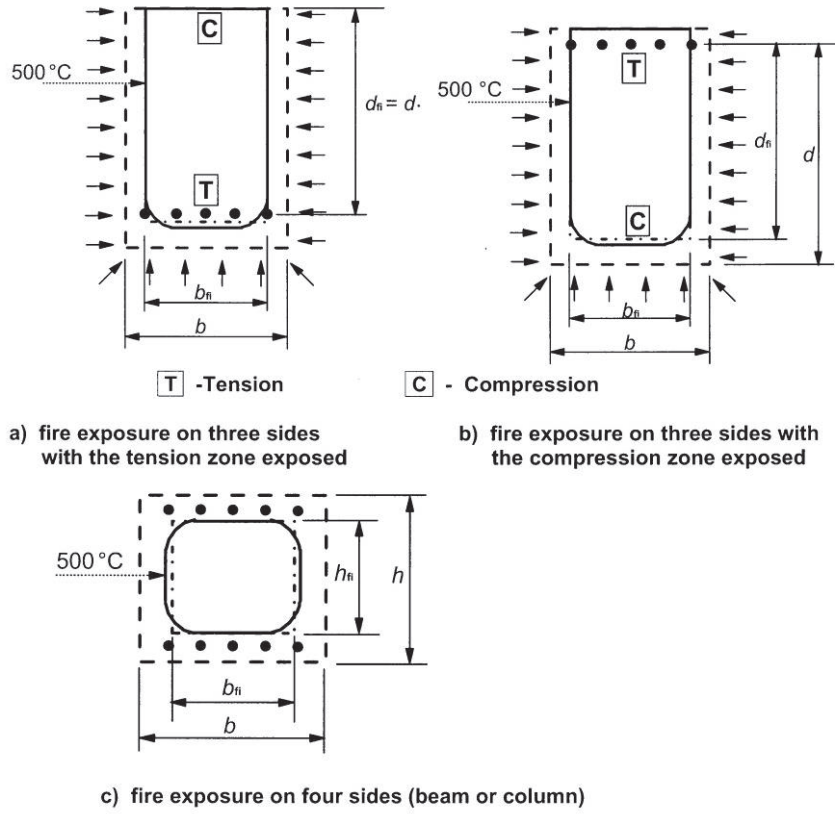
Reduced cross section of reinforced concrete beams and column
